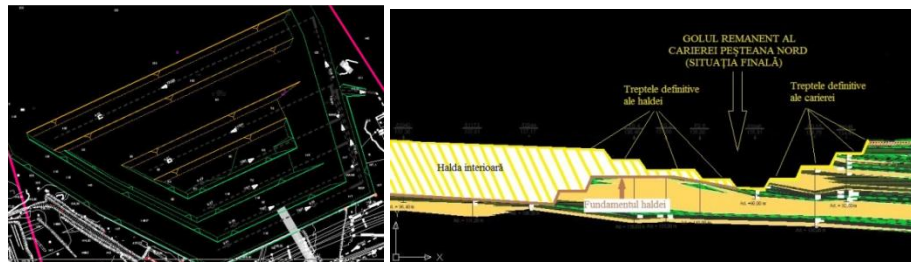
The Final Situation Plan of North Pesteana open-pit (left); Longitudinal section (right) (*, I.C.S.I.T.P.M.L., 2018)
